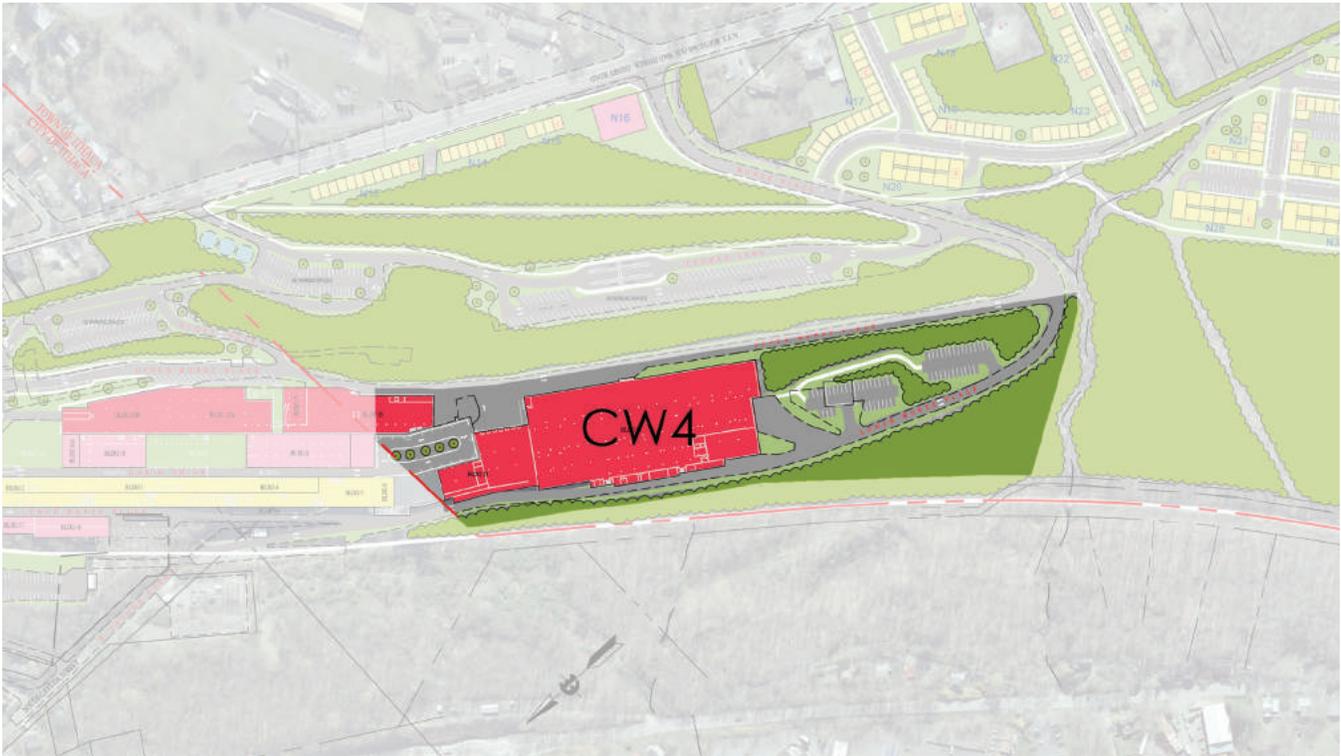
Conceptual Site Layout Plan - CW4 Sub Area (FE)
